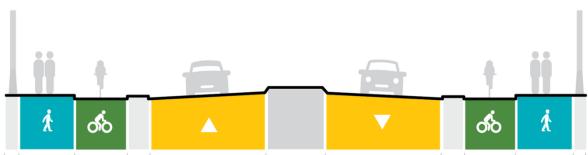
SH16 Main Road 24m urban arterial (typical bridge)
